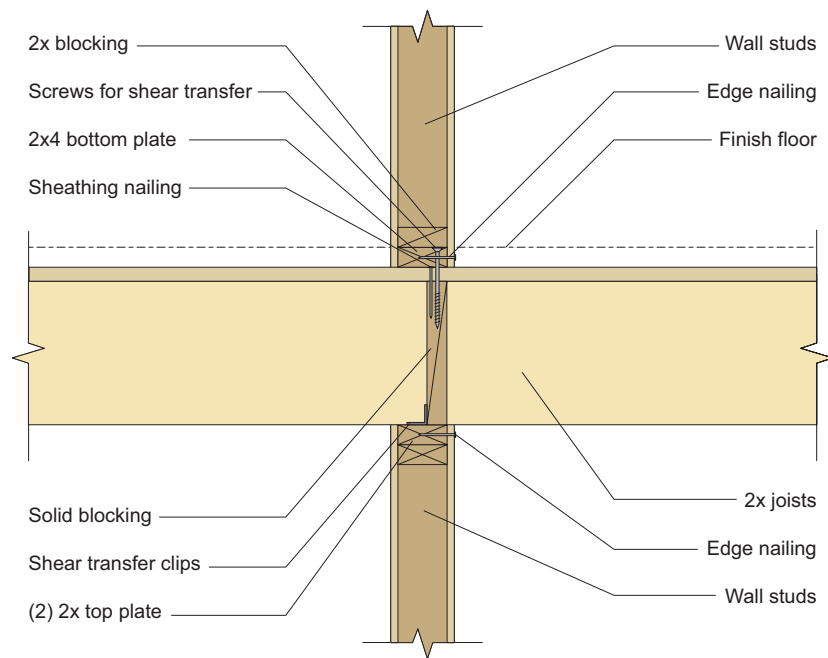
B: Typical platform floor framing at wall using sawn joists
